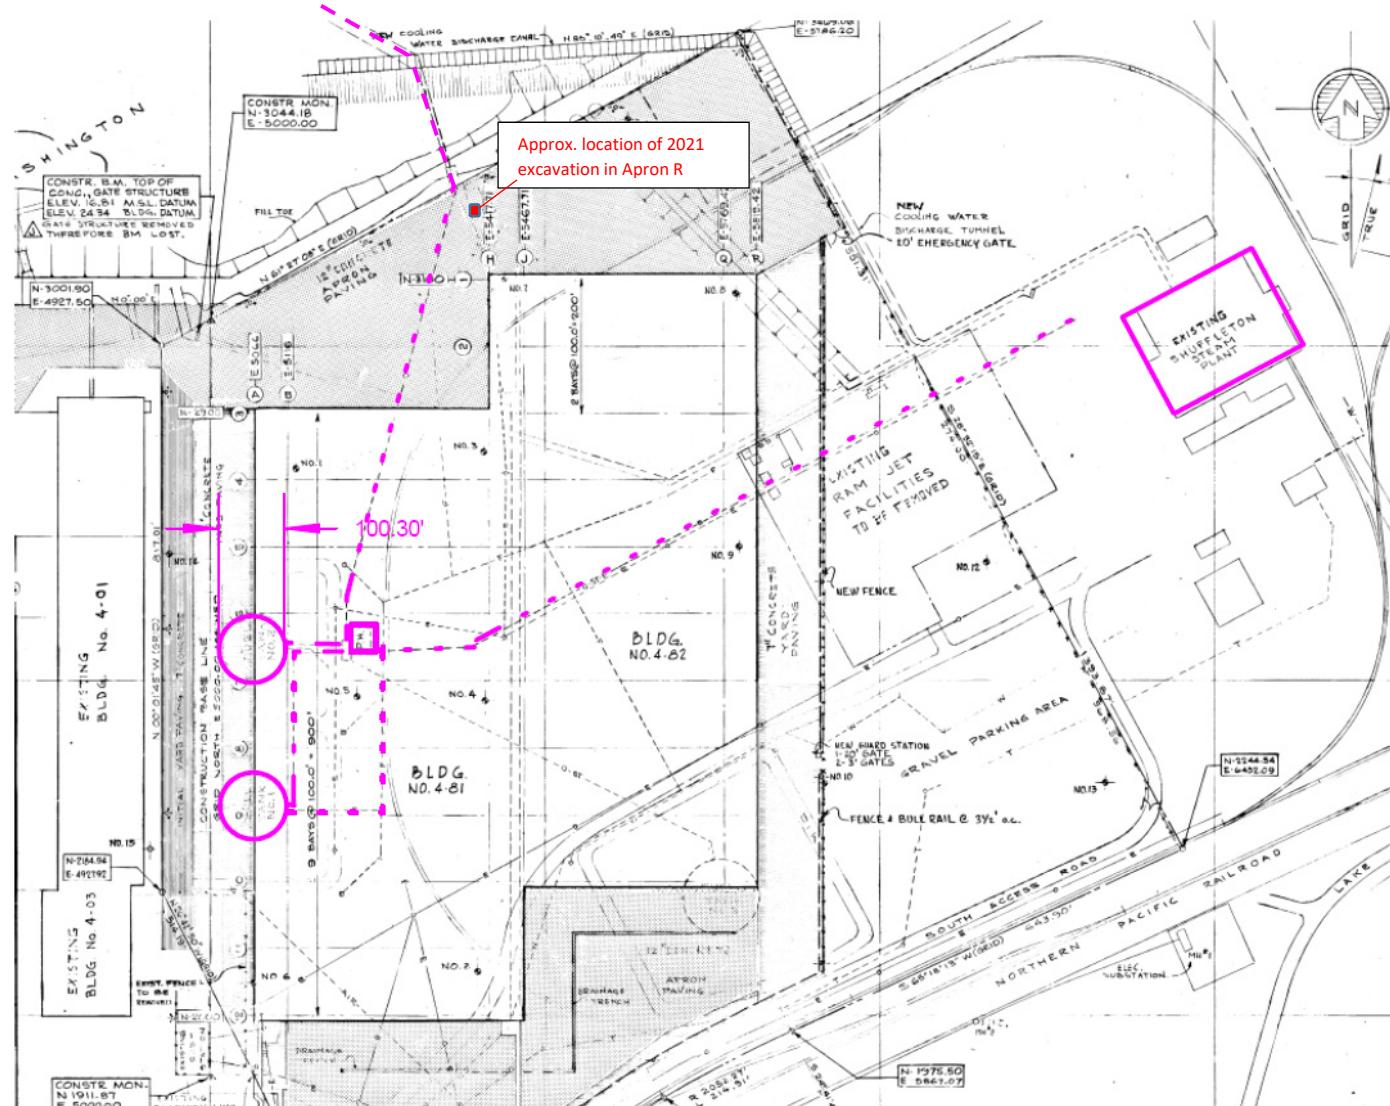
1967 Boeing 'As-Built' construction drawing of Building 4-81/82 area. The drawing background includes of the prior Shuffleton Power plant and the associated infrastructure highlighted in purple.
